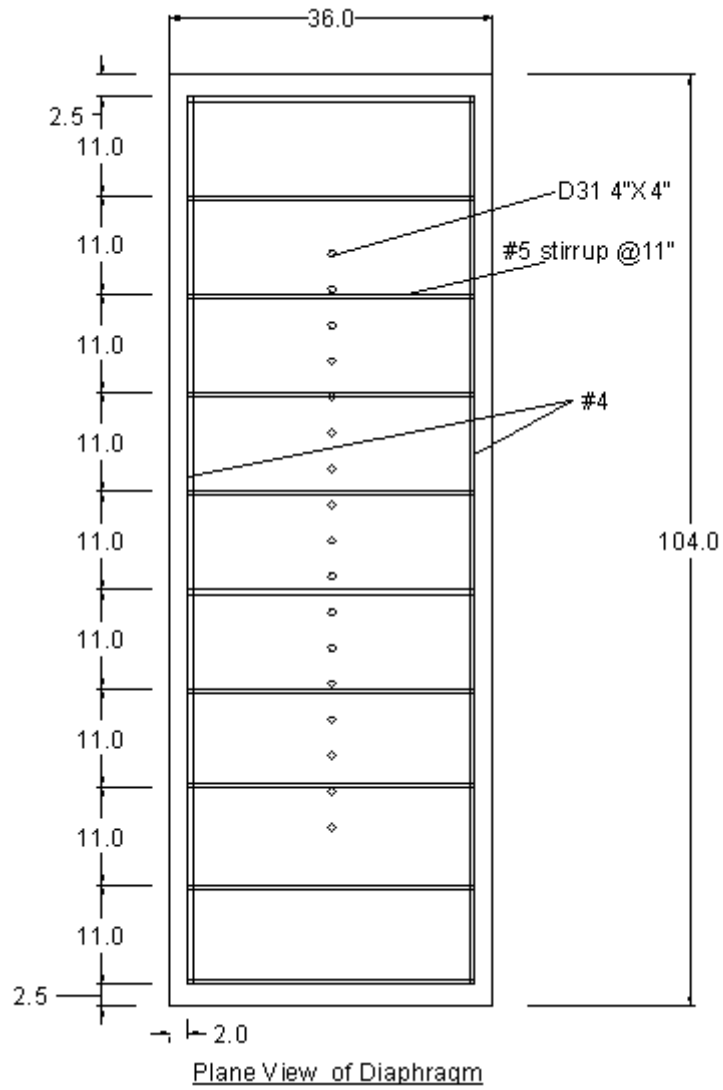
Reinforcement of Diaphragm at Top View
